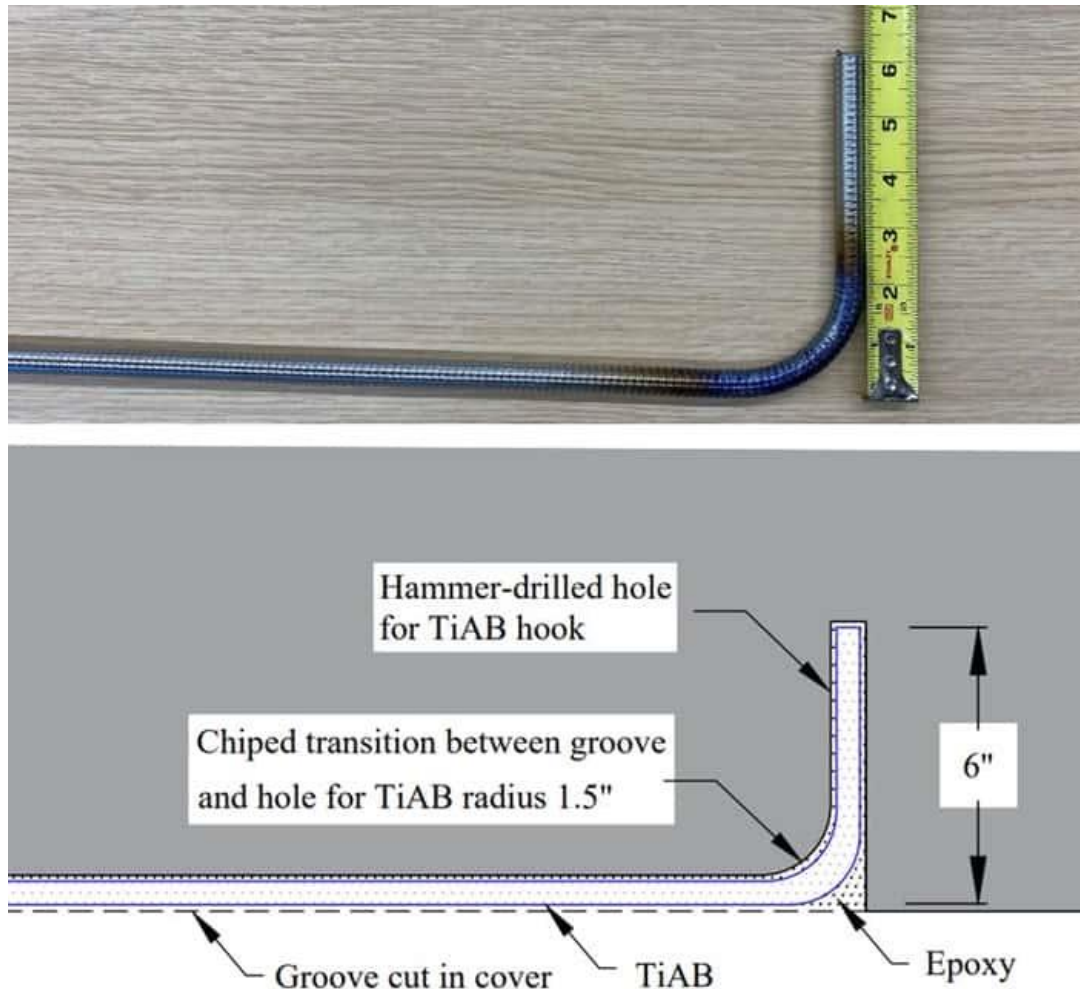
TiAB hook and section through hook end epoxied to concrete
